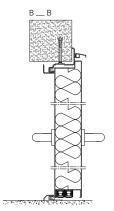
Vertical cross-section of the ECO Tech external seamless steel door with a
